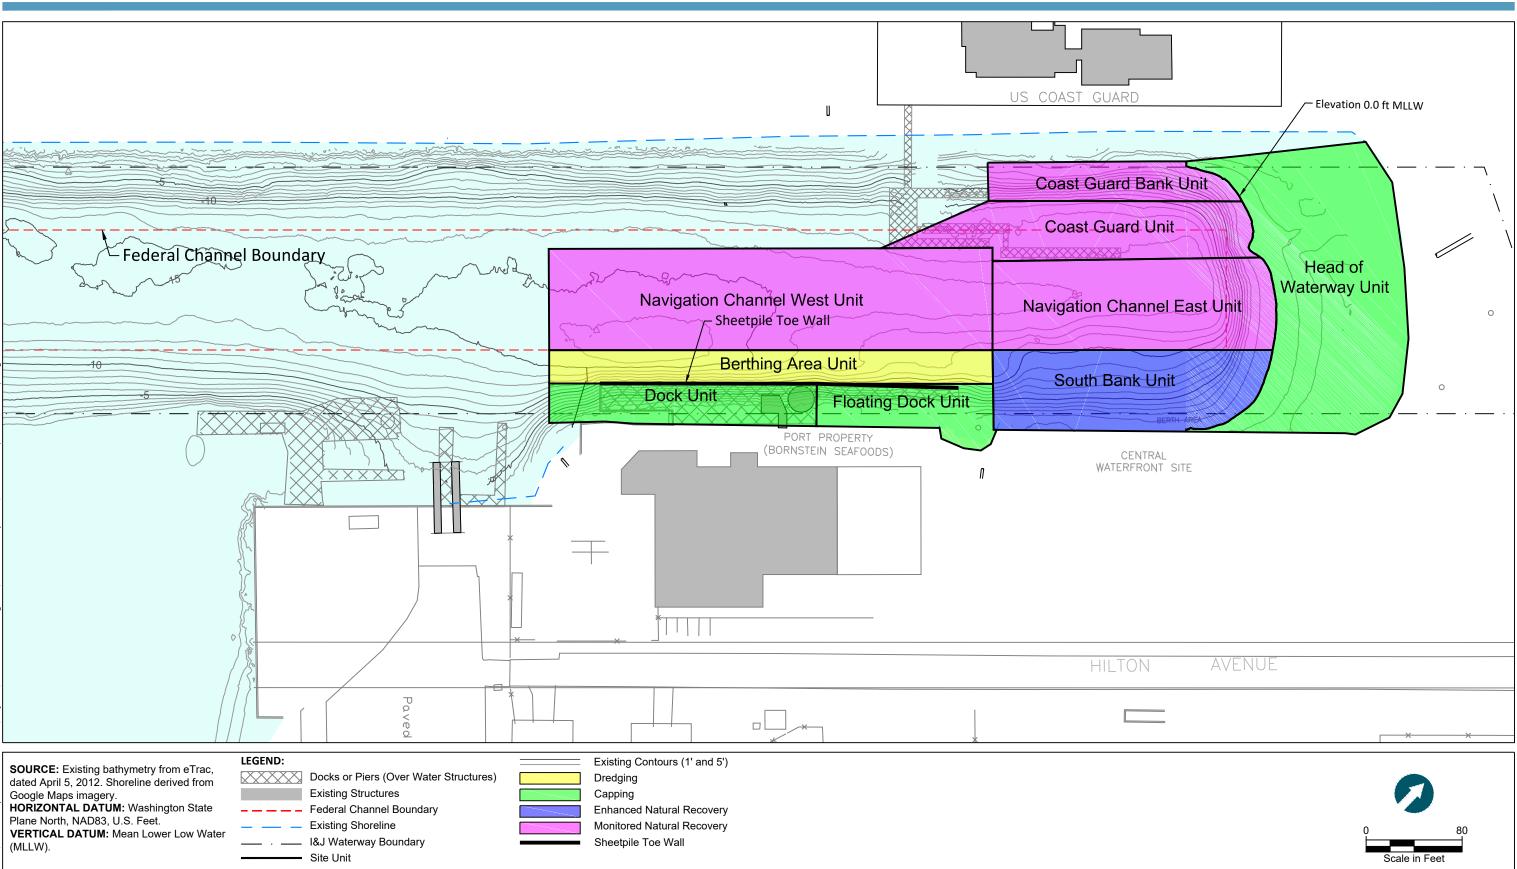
Alternative 2 Cleanup Action Plan I & J Waterway Site Port of Bellingham
